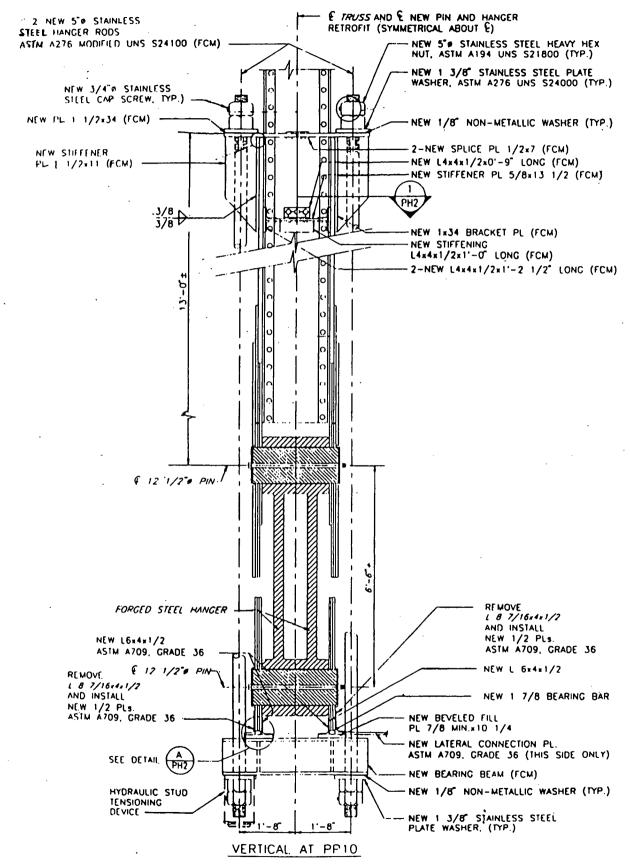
Walt Whitman Bridge, approach truss (Modjeski and Masters).
